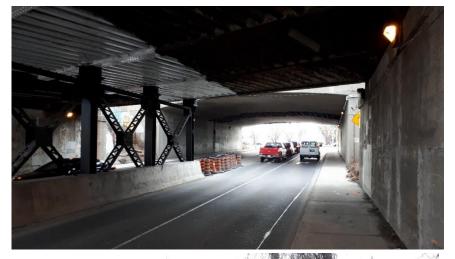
Concrete sidewalk and Parkside Drive on the western side, looking southeast.
